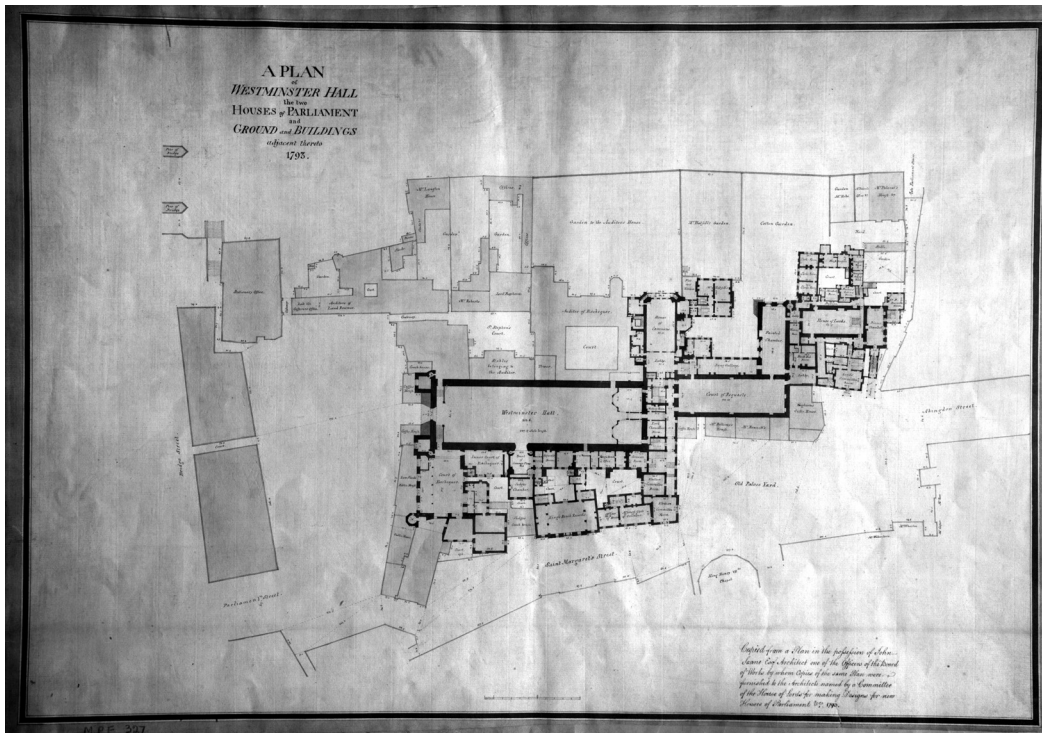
Westminster Hall and the New Stone Building in 1793 (TNA: PRO, MPE 1/327)
